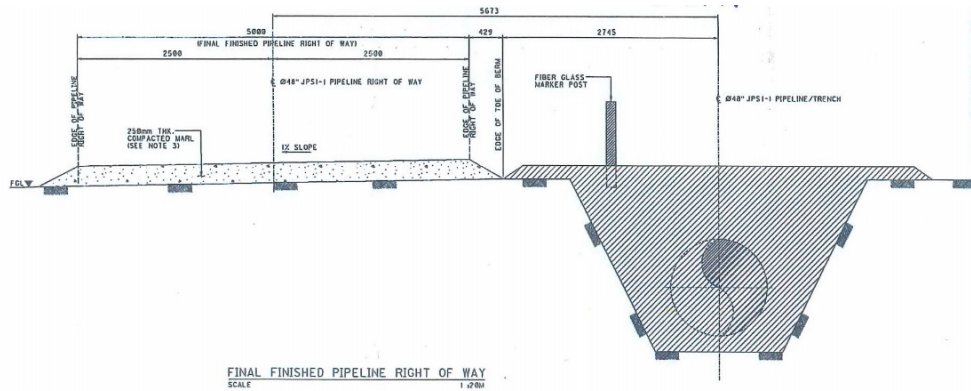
Typical diagram of pipe trench and working zone in sandy soil section
